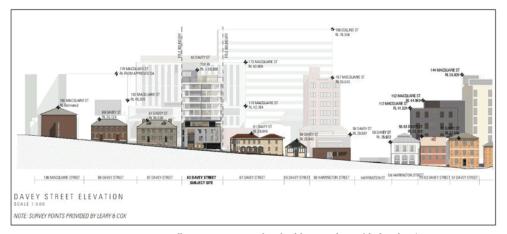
Davey Street streetscape, illustrating surrounding buildings and variable heights (source: JAWS Architects)
